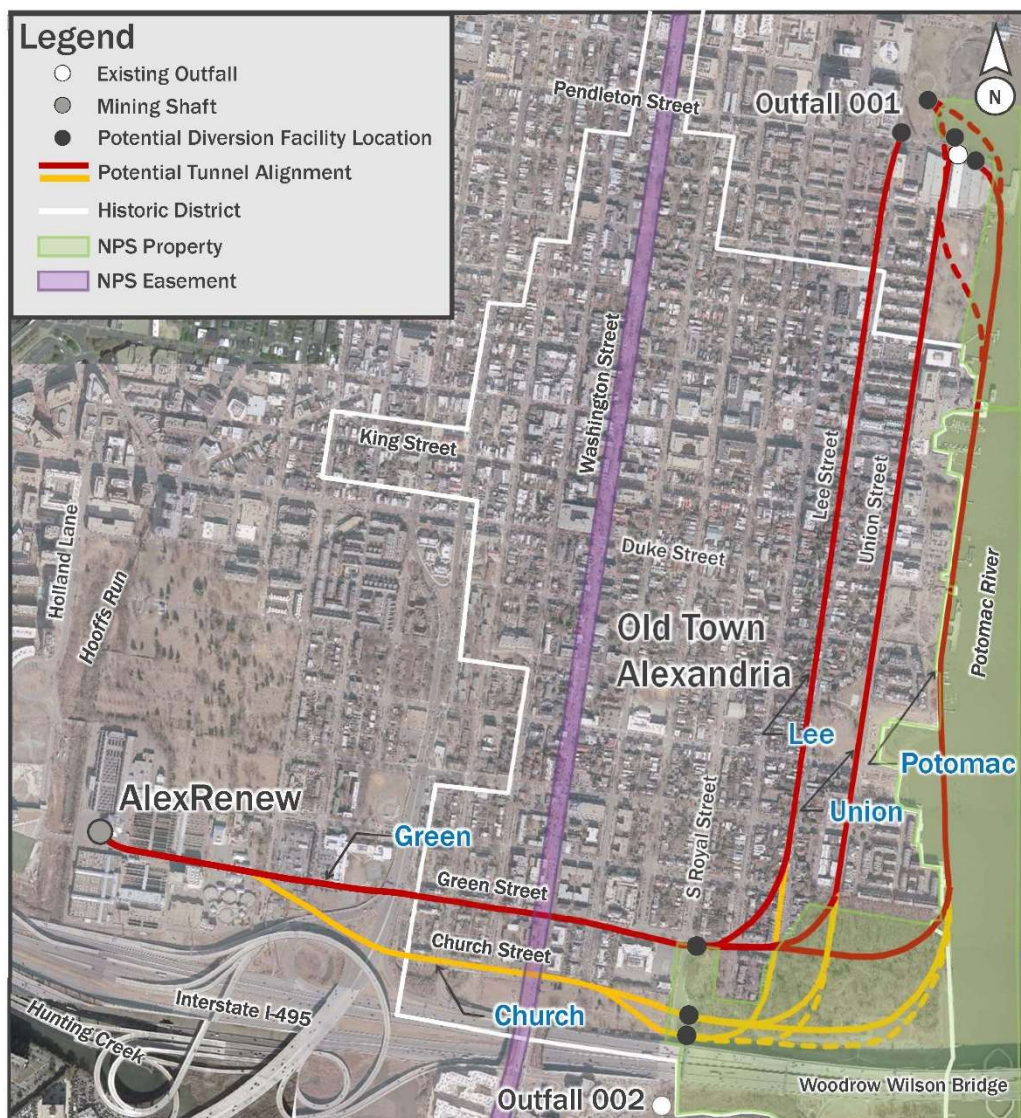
Outfall 001/2 Tunnel System Alignments
